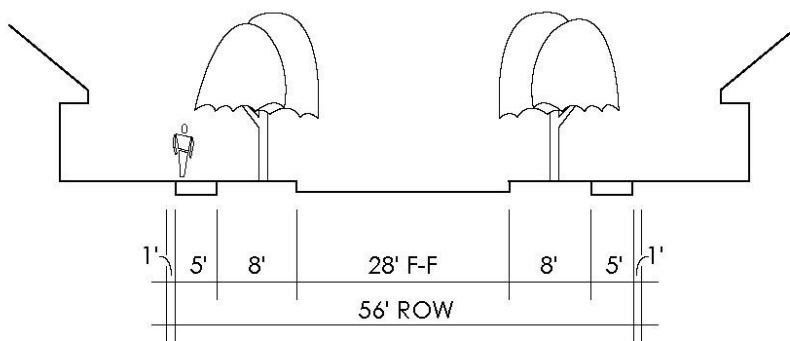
Schematic sketch of a typical minor street cross-section with two-sided parking.
